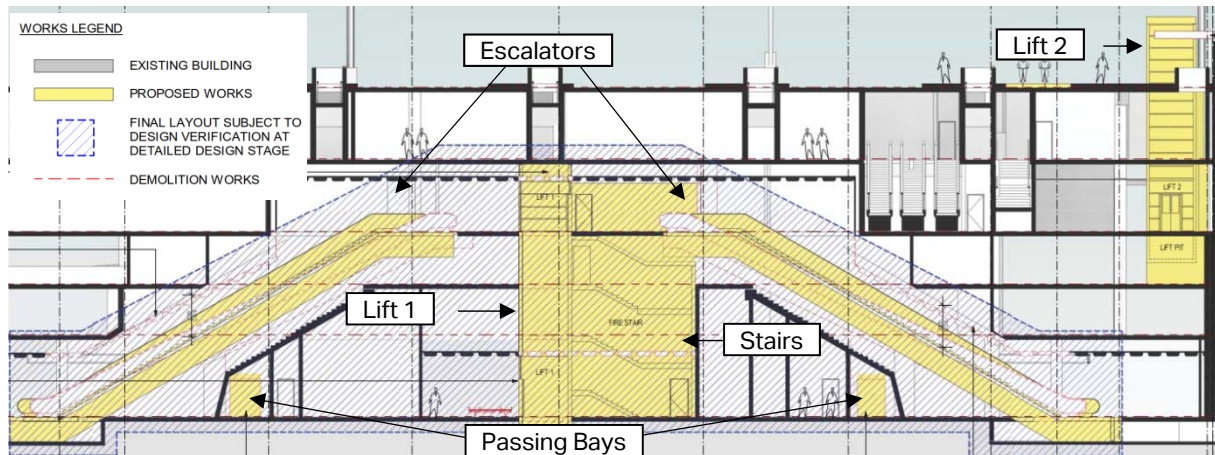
Elevation showing proposed lifts, stairs, passing bays and escalators
